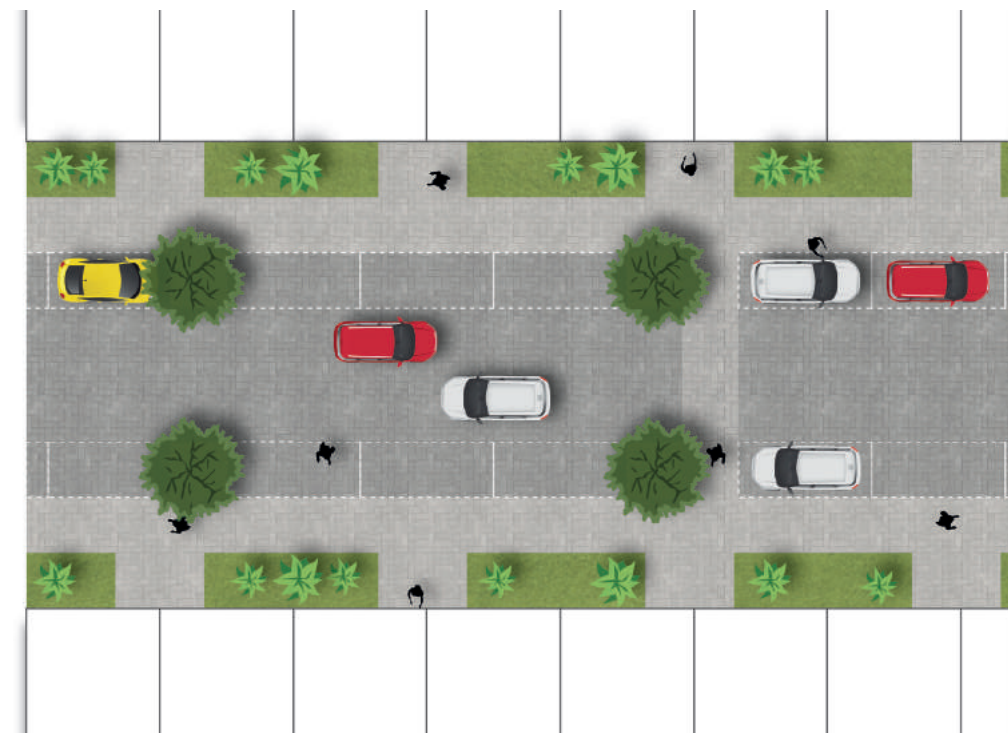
A good formal arrangement for a primary street that incorporates parallel parking with regular tree planting within kerb build outs reducing its impact on the street space (Plan)
